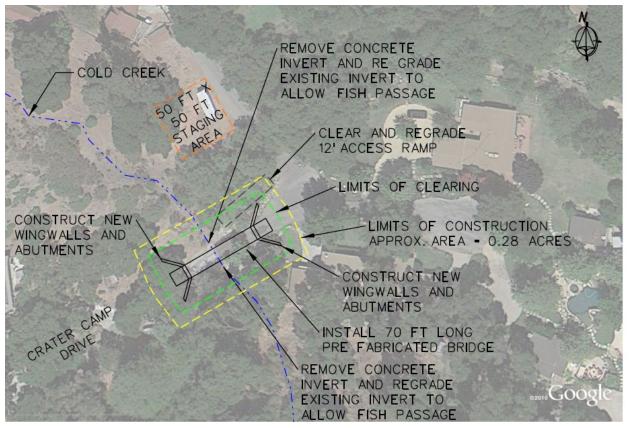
CC3, Crater Camp Road Crossing Schematic Design
